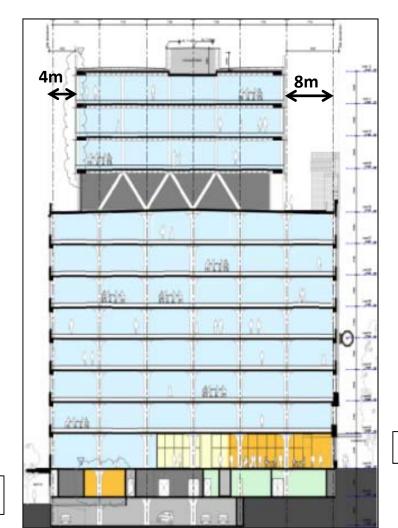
The approved facade restoration and additional 4-storeys to Red Cross House (Clarence Street/eastern elevation).
